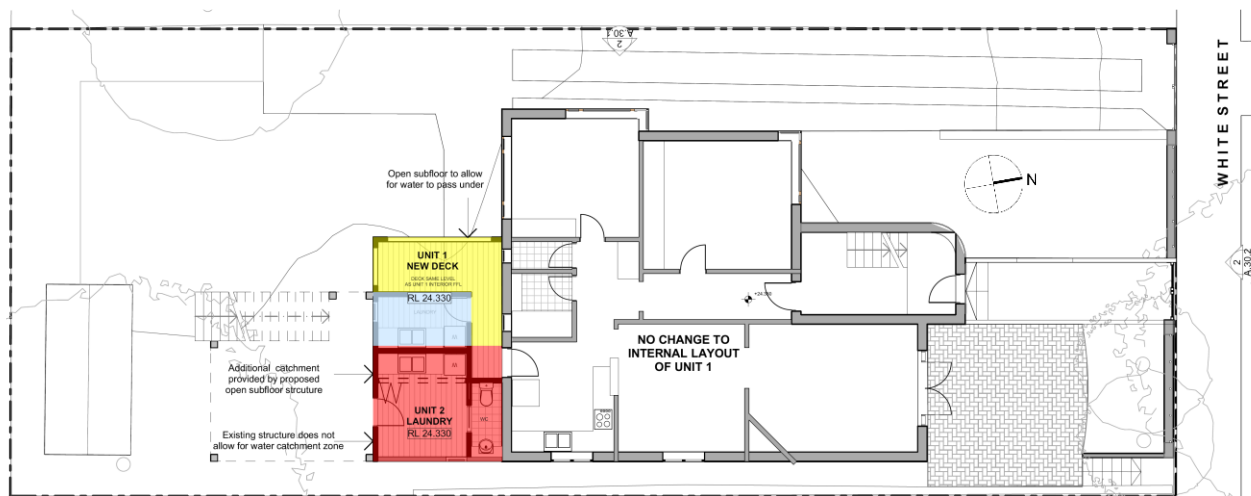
View of proposed development area, with existing ground floor level marked at arrow
